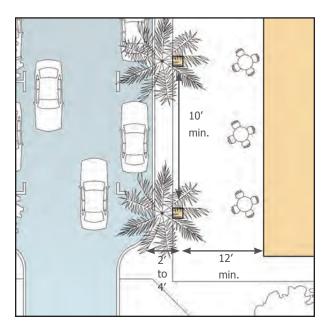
Ground Floor Plan View, Arcade Frontage - Roof not shown (Illustrative)
